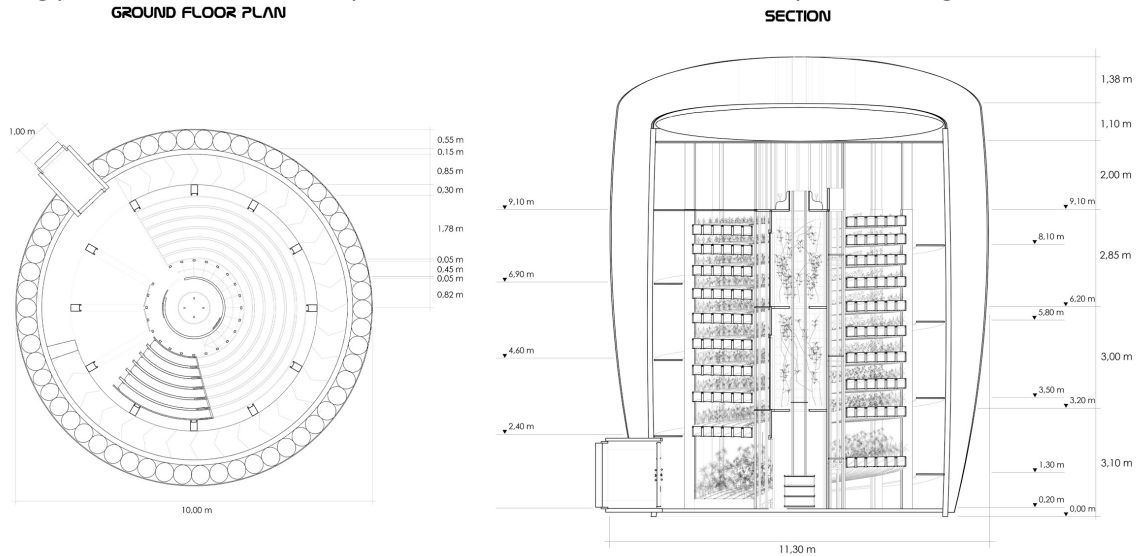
CAD of the ground floor plan and section view of the BEAVER architecture with key dimensions
